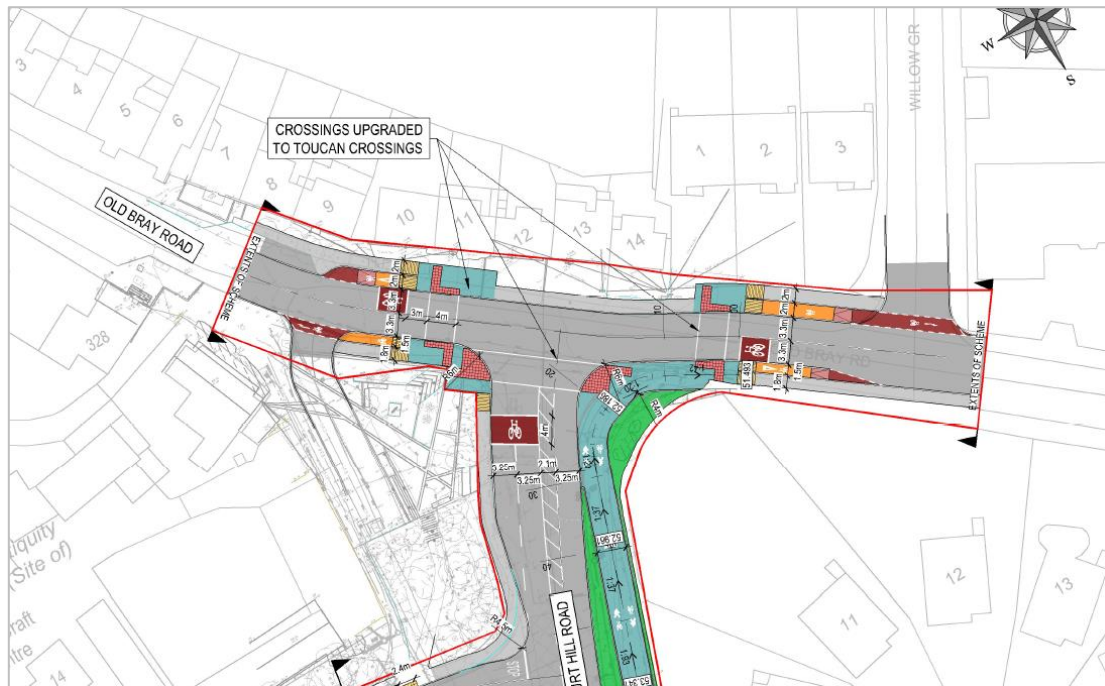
Proposed Junction Upgrades at Cornelscourt Hill Road / Bray Road Junction
